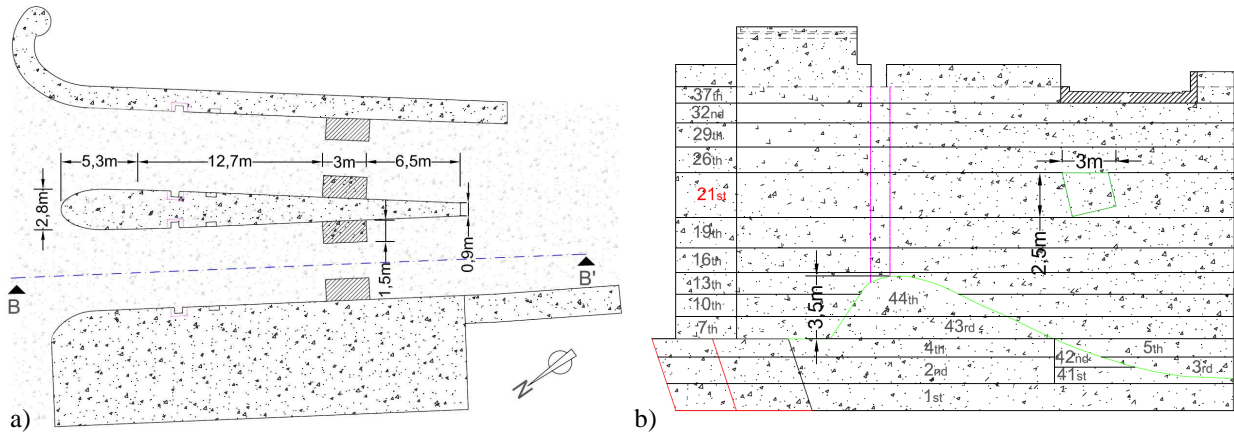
Central wall of the spillway: a) plan; b) longitudinal cross section B-B'
